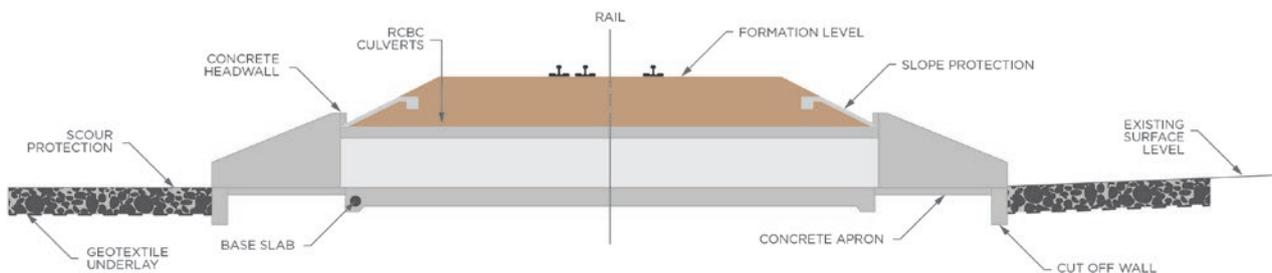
TYPICAL SECTION OF A CROSS-DRAINAGE CULVERT
